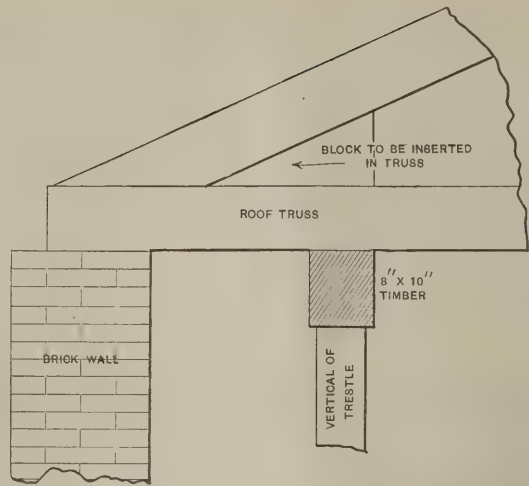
Foot of One of the Roof Trusses, Showing Arrangement at Point Where Hoisting Trestle Is Used.
